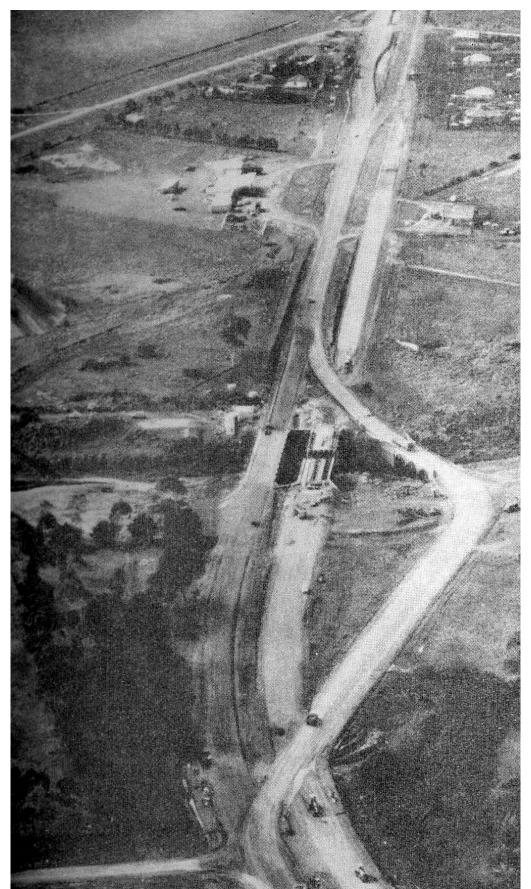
1957 photo of the construction of the realignment to replace the old Kororoit Creek bridge *CRB
